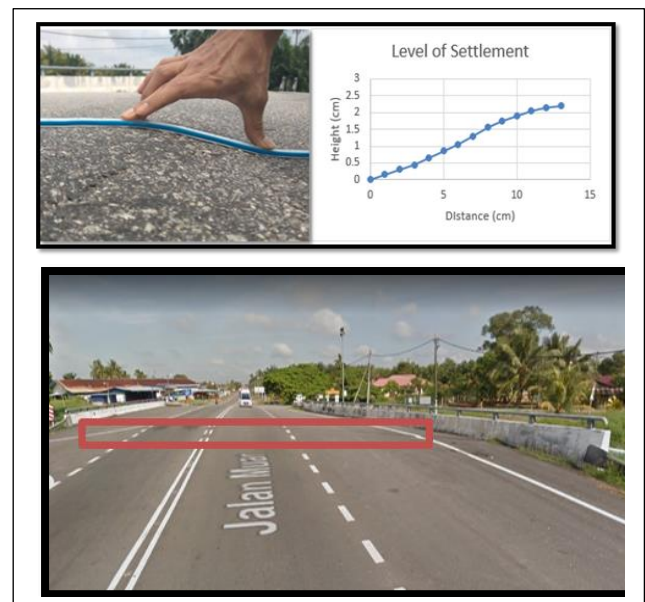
Elevation of uneven joint in Jambatan Parit Jamil
